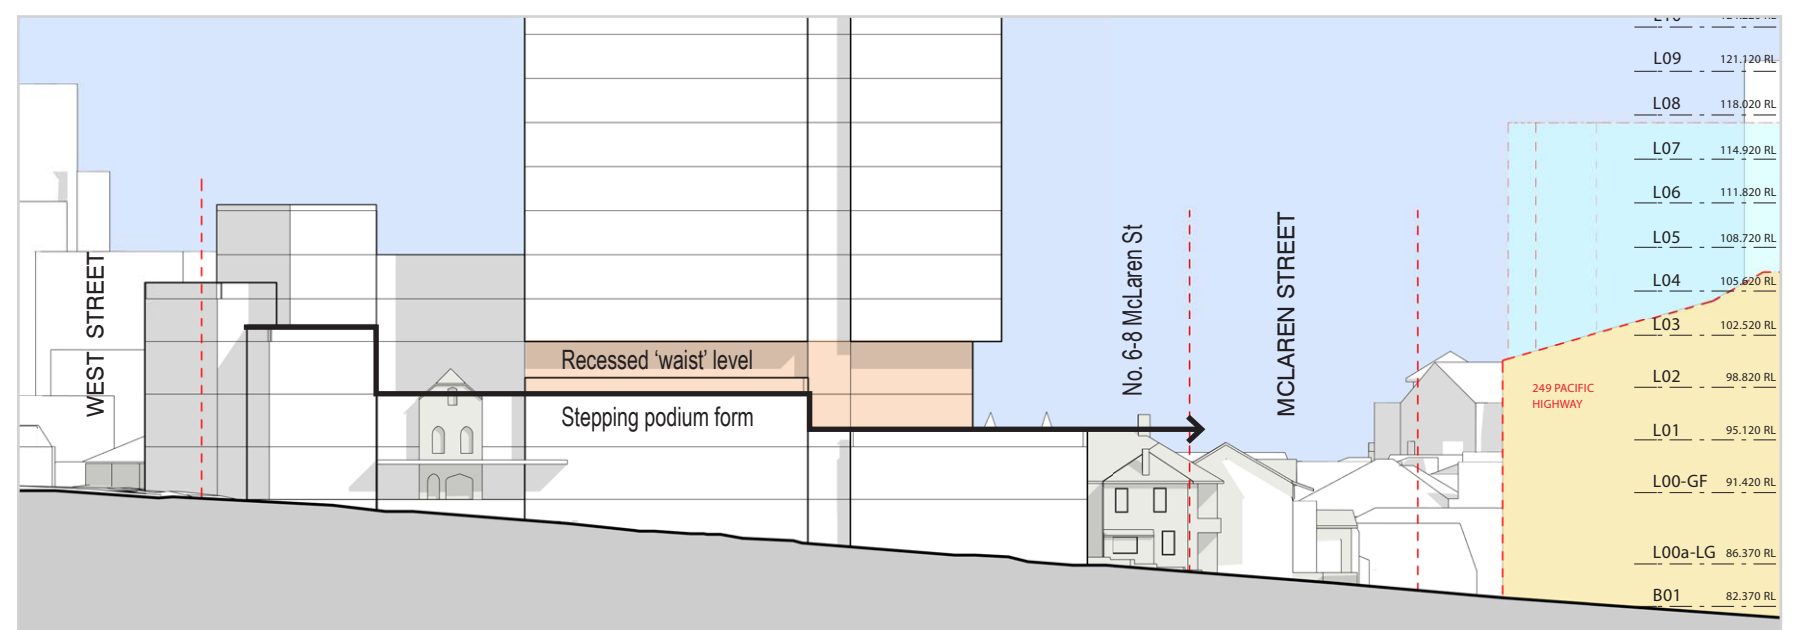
Elevation along Pacific Highway (adapted from Building Envelope Study and Reference Design - Elevation - West - Pacific Highway).
